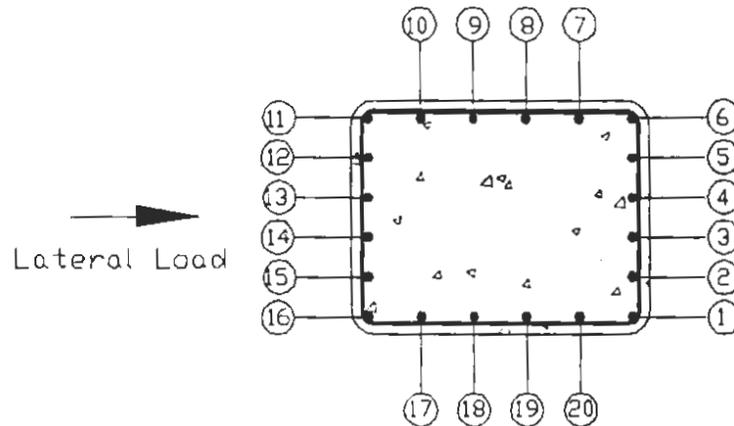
Locations of Column Rebar for Shear Enhancement Rectangular Columns
